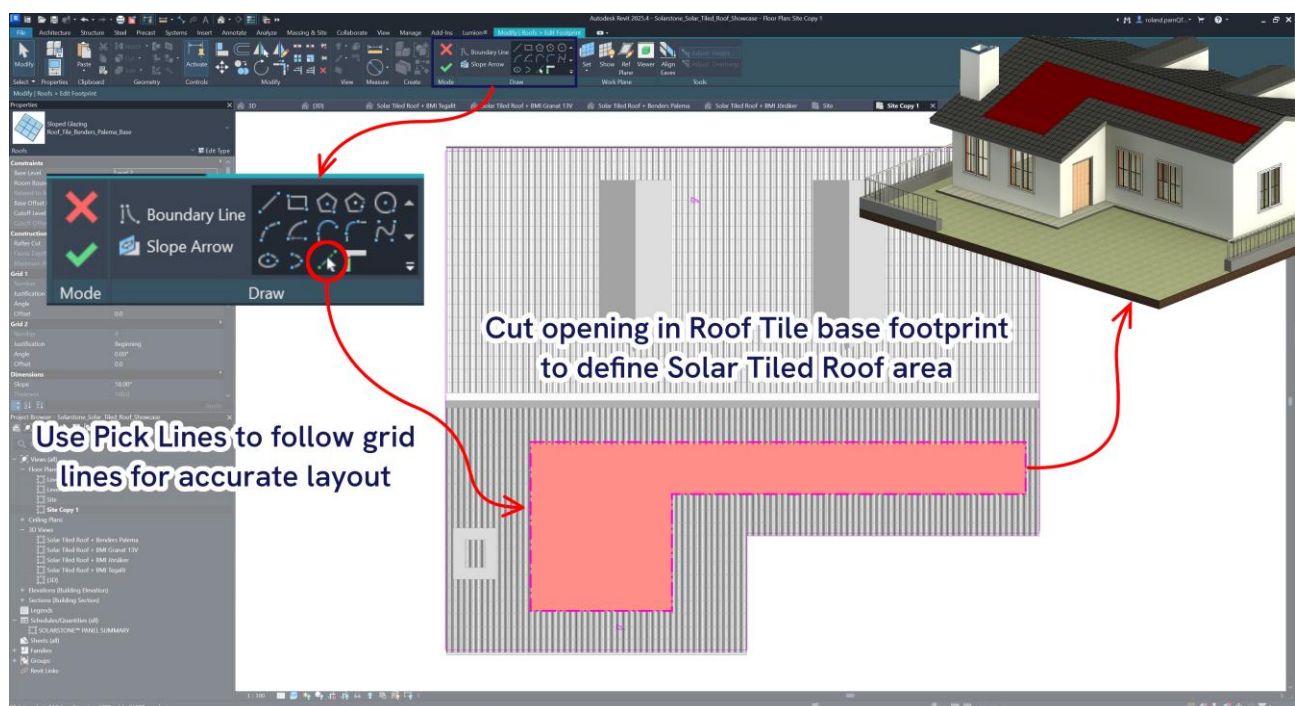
Solar Tiled Roof area defined within the Roof Tile Base footprint.
